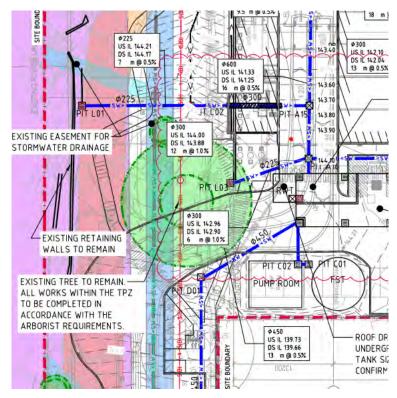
Excerpt of proposed storm pipe alignment above the northern TPZ of Tree 44, Stormwater Drainage Plan, Dwg. No. C09431.01-DA41, Issue C. Costin Roe Consulting, 23 April 2025.
